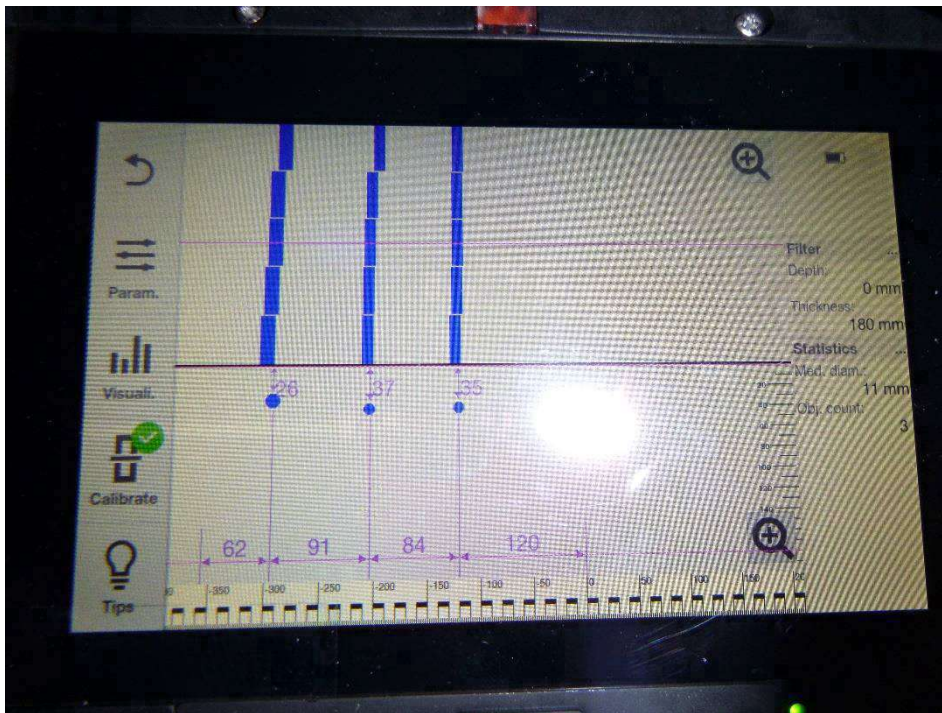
West half joint south face soffit, scanned horizontally to show bending reinforcement.
